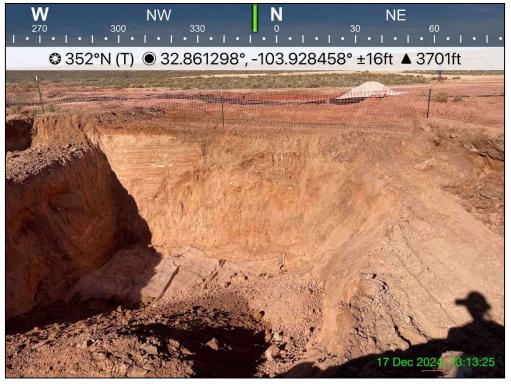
Excavation overview, facing west-north FL06@20 and SW15
